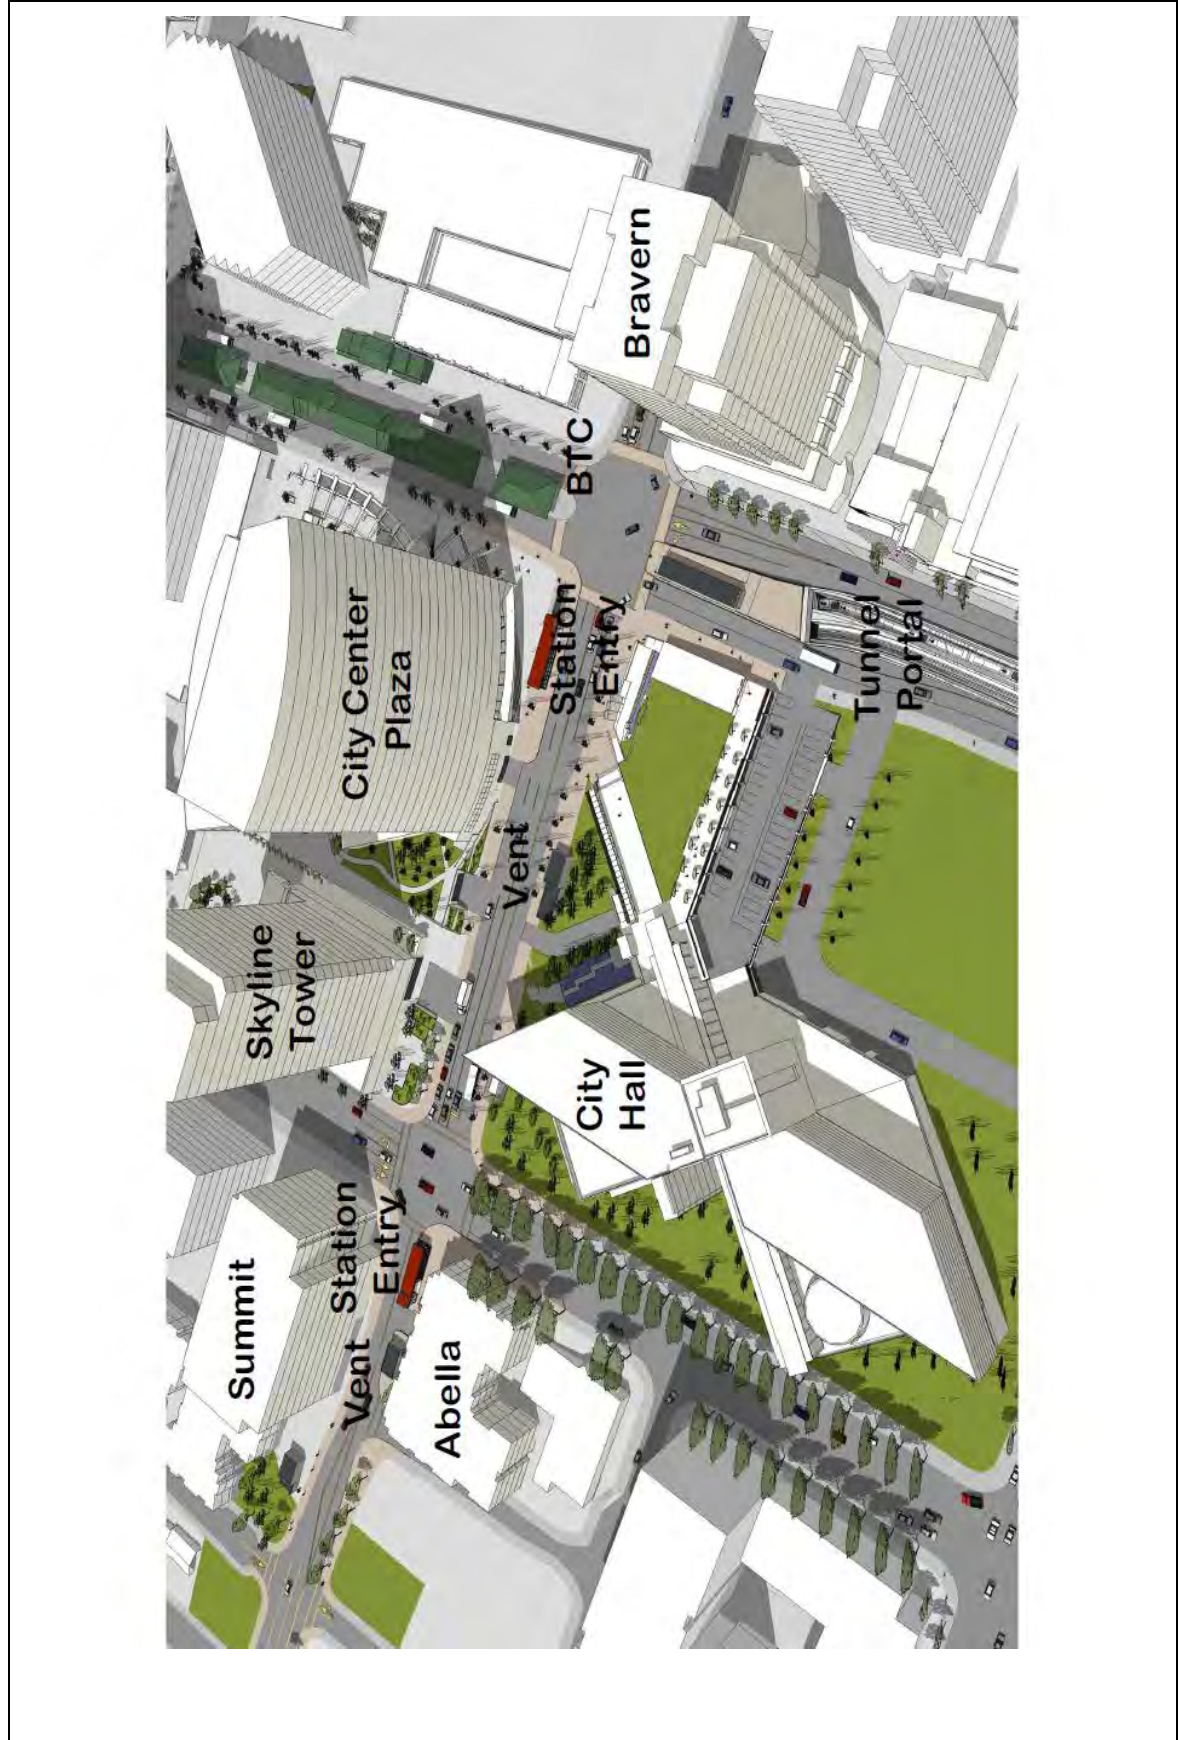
3: Downtown Station Design- Stacked Tunnel Connection to Bellevue Transit Center – Cost Savings Idea - 3b
